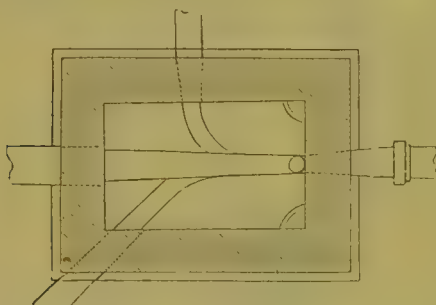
PLAN OF INSPECTION CHAMBER.
